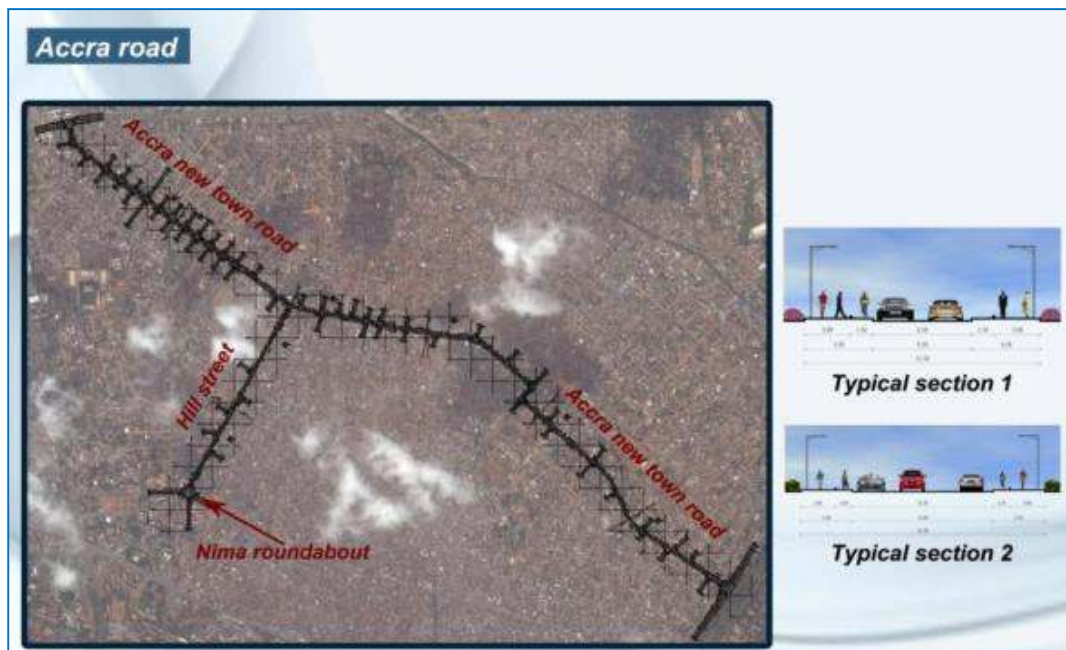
Typical cross-sections of Accra New Town road and Hill Street, showing NMT provisions
